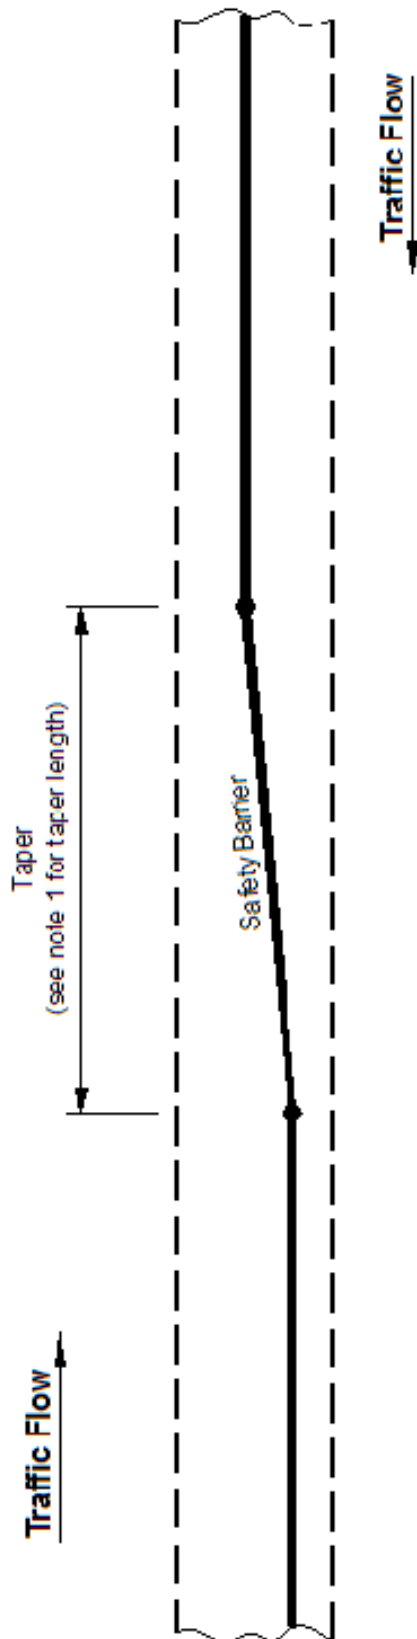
Provision of Rigid Safety Barriers at Restricted Headroom
